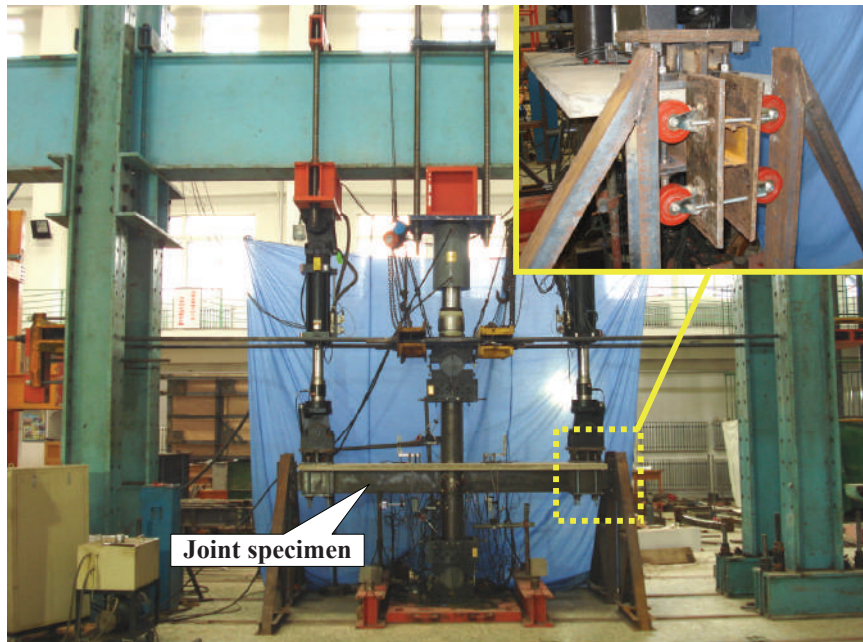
Test assembly for CFST column and reinforced concrete beam in a beam-to-column connection test. (Photo courtesy of Professor L.-H. Han)
